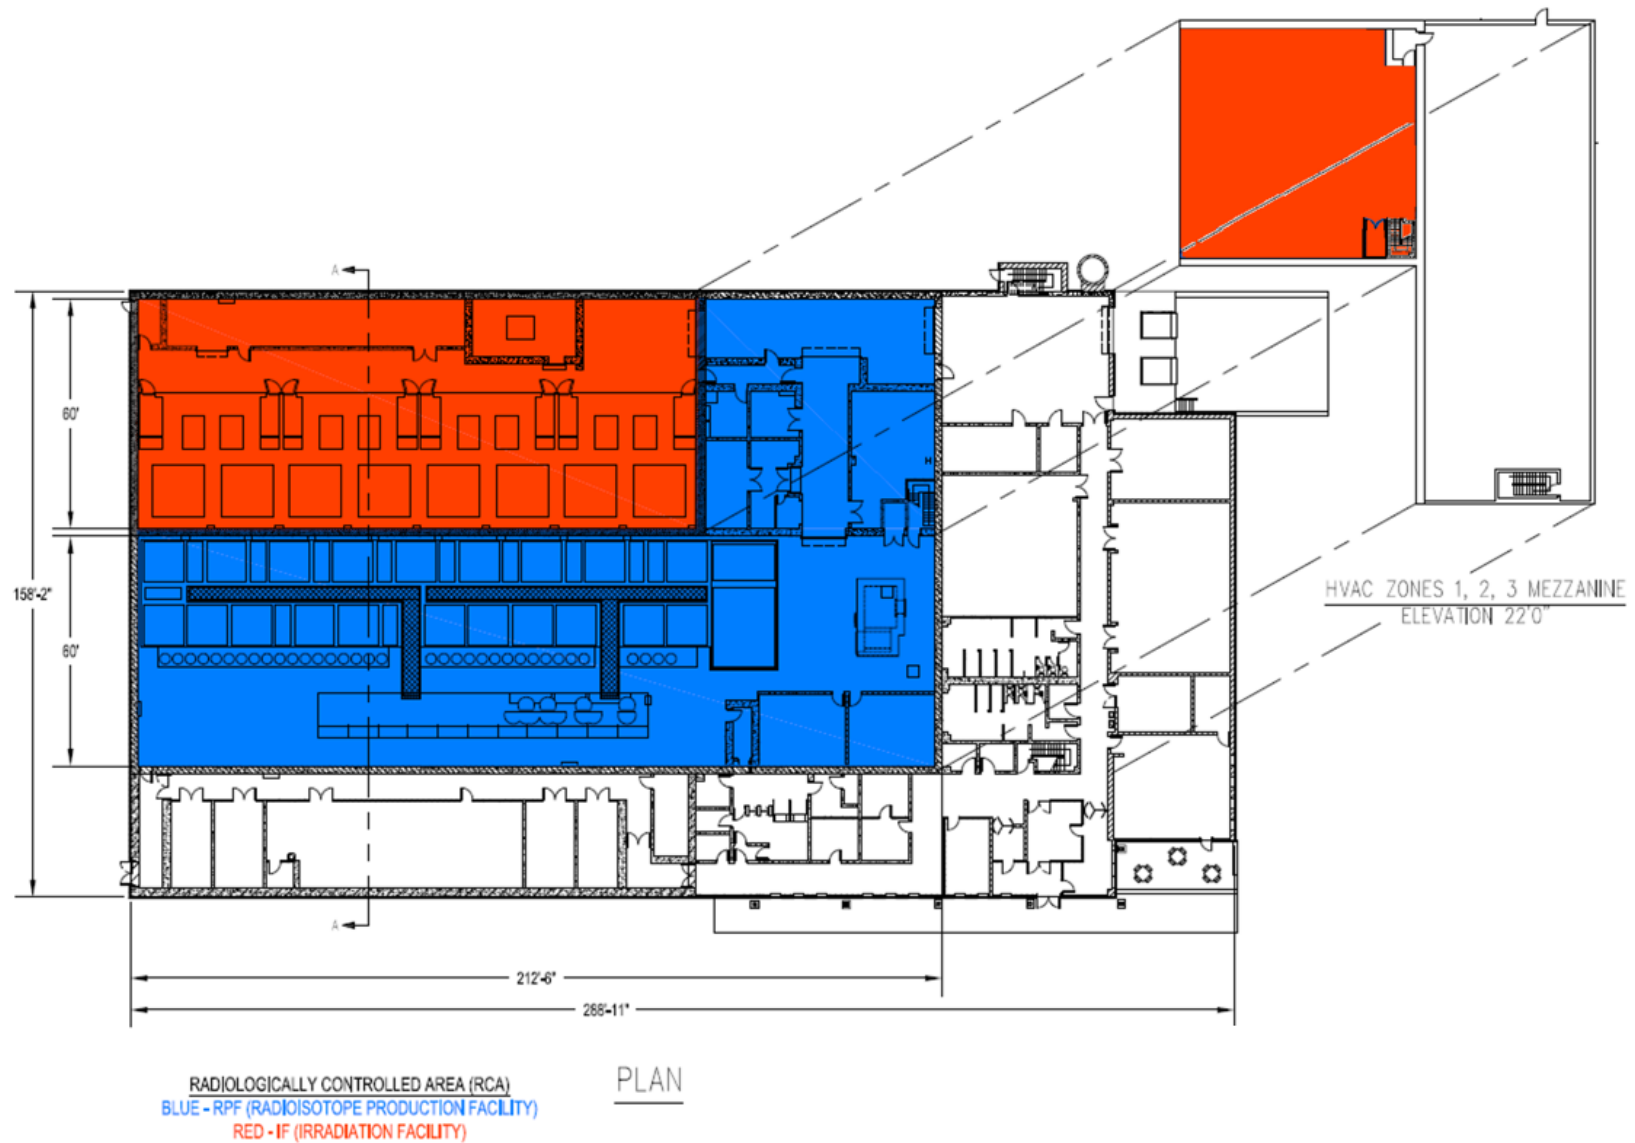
SHINE Main Production Facility General Arrangement (Sheet 2 of 3)
